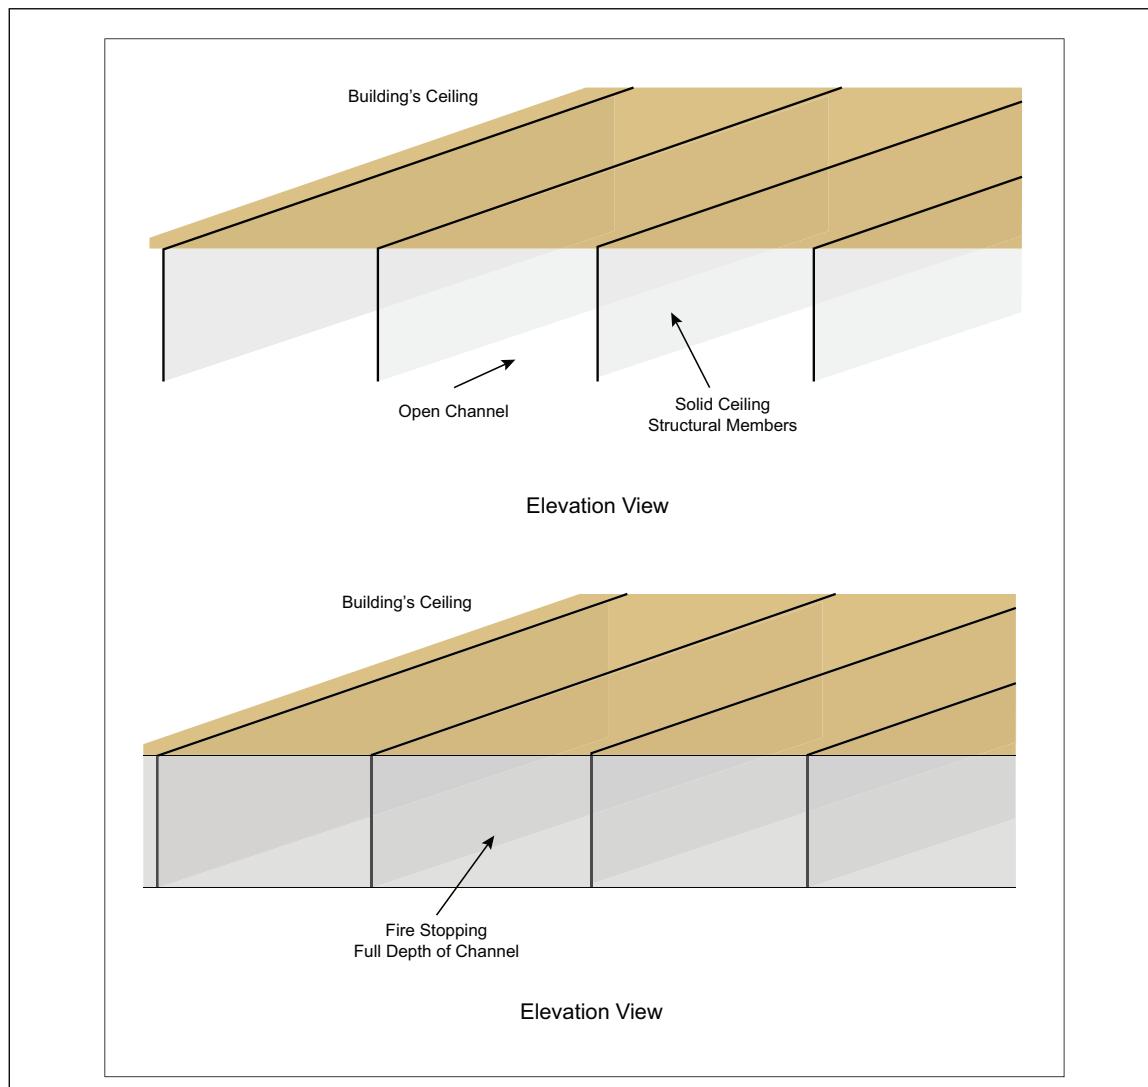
Fire-stopping channel created by obstructed ceiling construction
